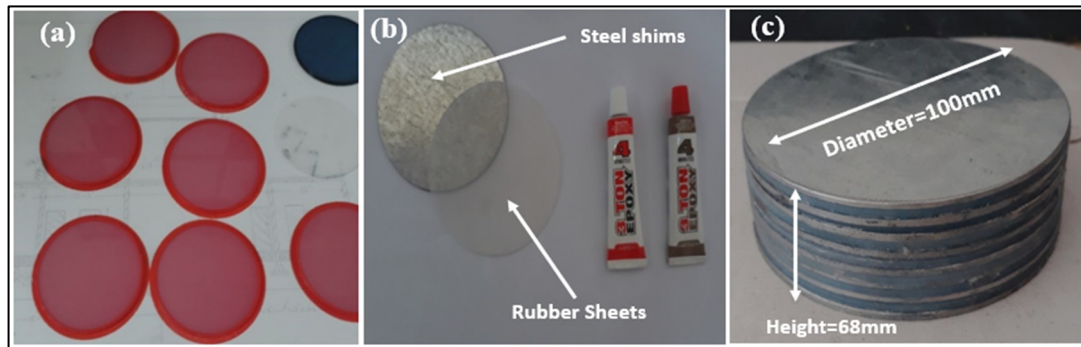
(a) Moulding of silicone rubber layers in 3D printed moulds; (b) Steel and rubber layers along with the epoxy used; (c) Prepared laminated Rubber Bearing
